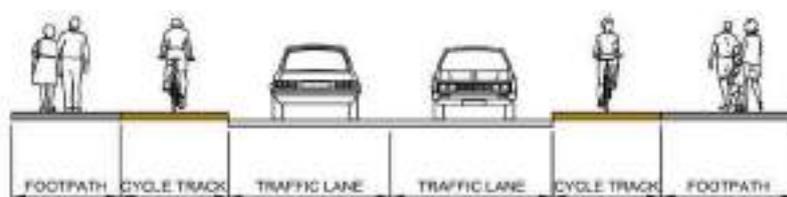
Cross section of separation of road, bicycle lane, and sidewalk
